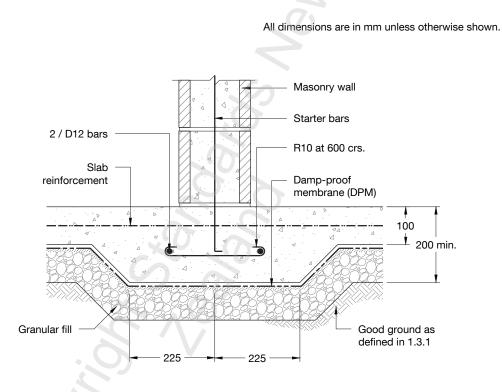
Support of loadbearing internal walls (see 7.11.1)
